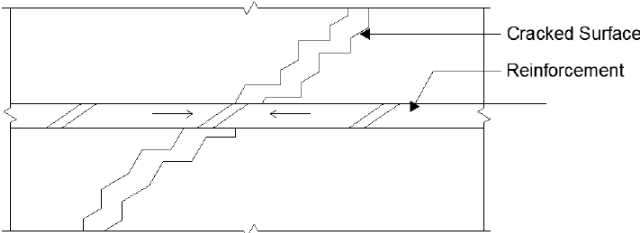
Section of a Deep Beam Showing the Horizontal Reinforcement Resisting Cracking
